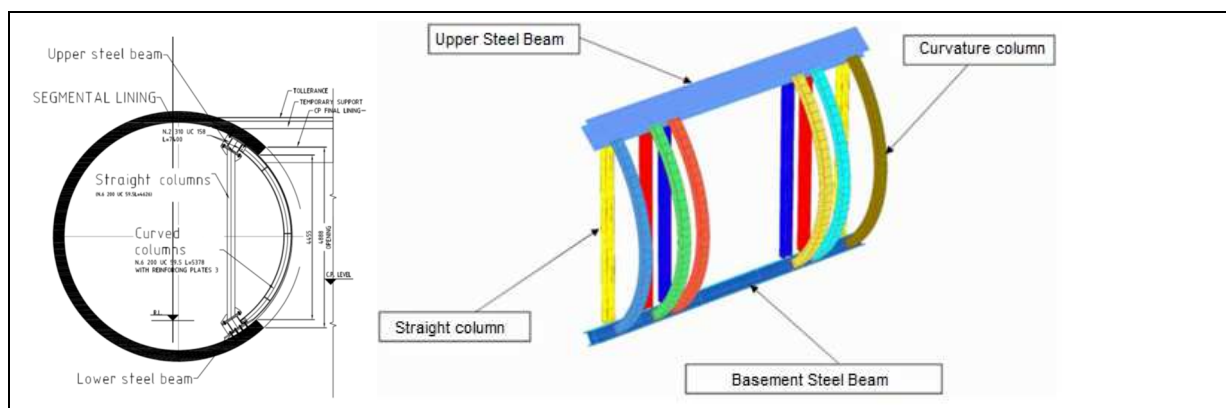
Temporary Steel Frame: Structural steelwork and 3D STRAU7 model
